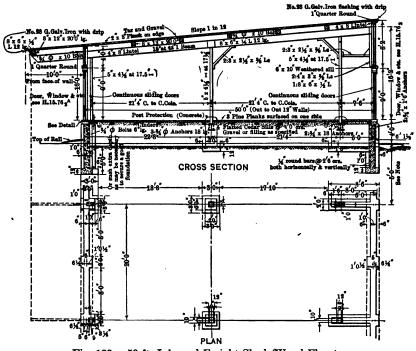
50-ft. Inbound Freight Shed (Wood Floor).
